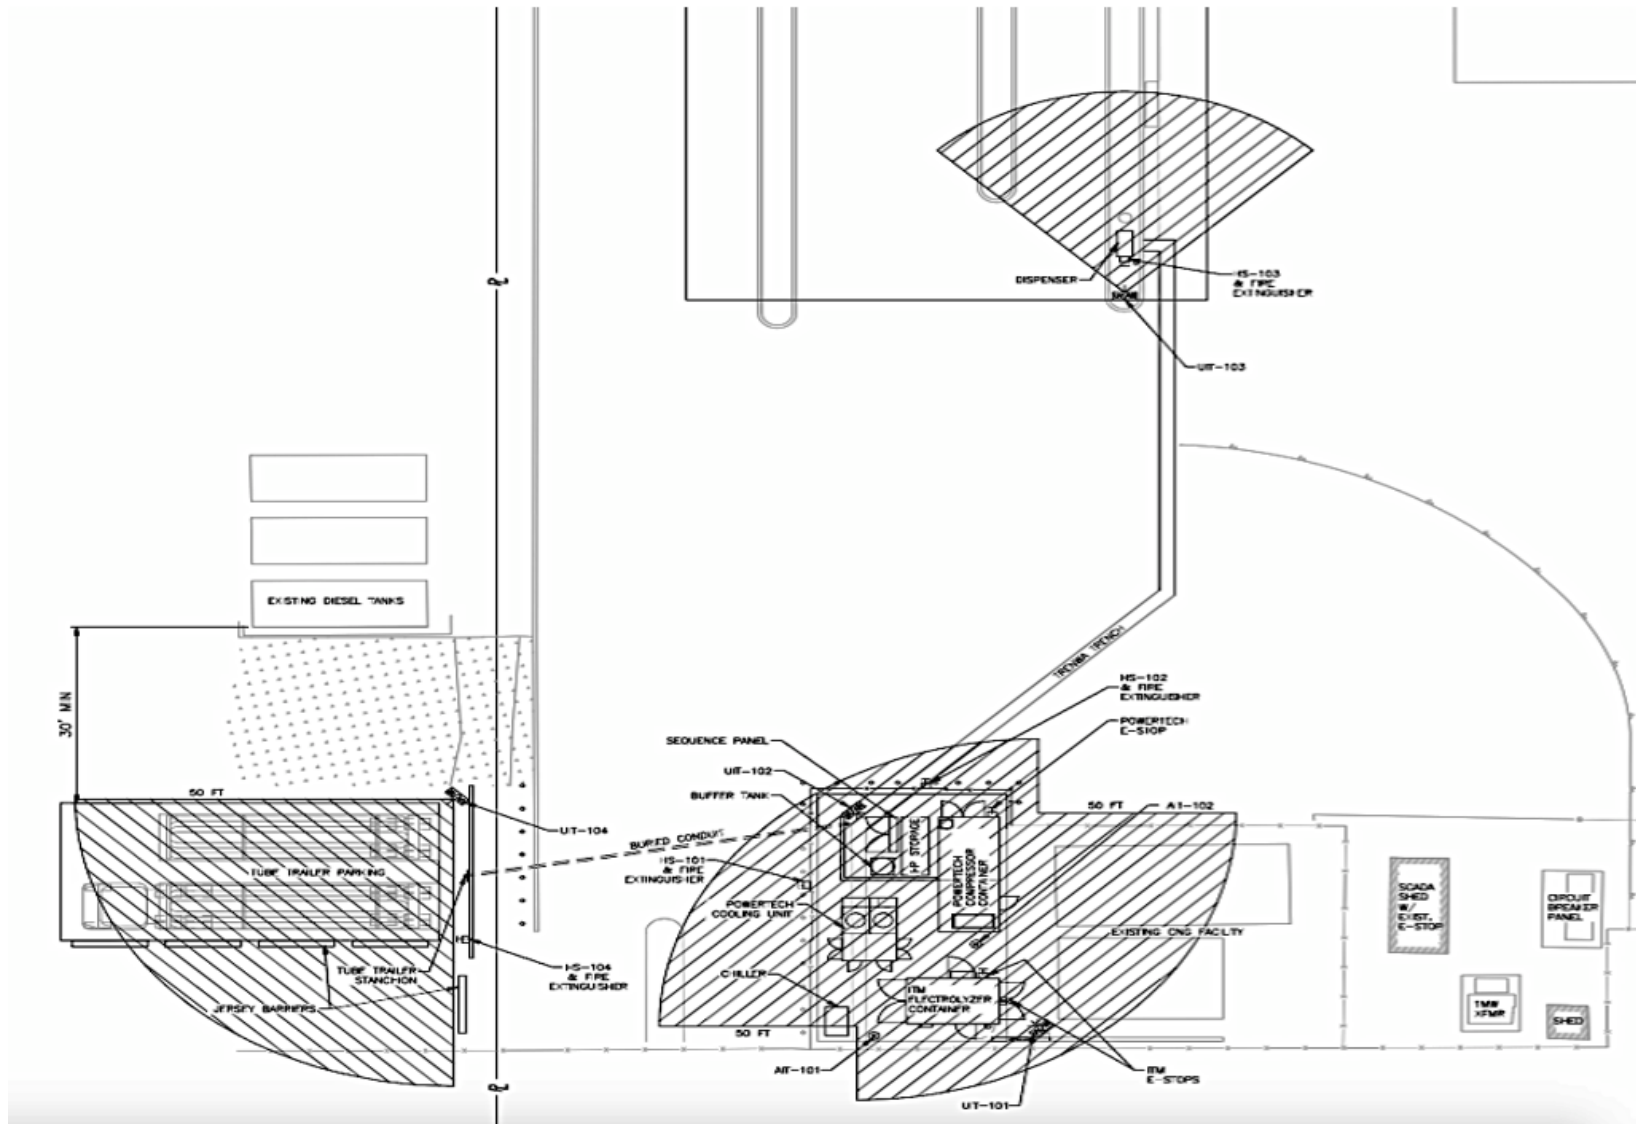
Final Layout Plan Submitted to City of Riverside for Permitting
